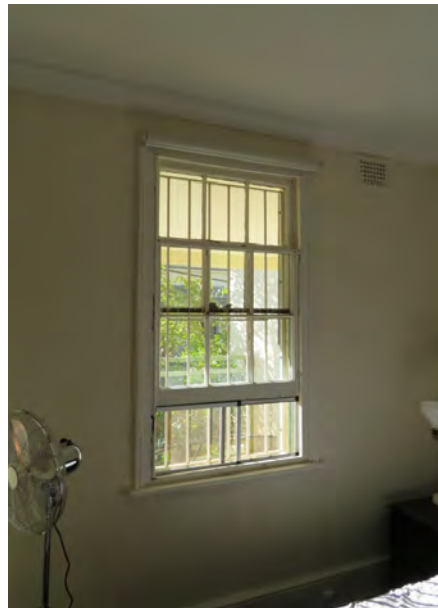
Front first floor room in 98 Brougham Street showing later cornices and original skirtings.
